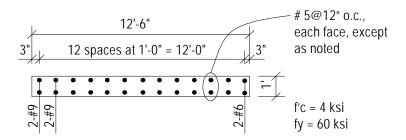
Example Two-Dimensional Wall Pier With Unsymmetrical Reinforcing
